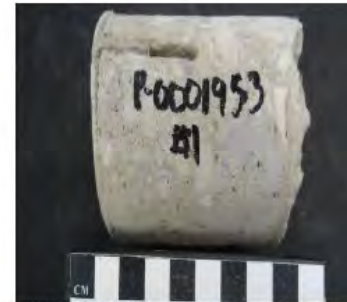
A: Core No. 1 – Core profile, as received, top surface at left.
